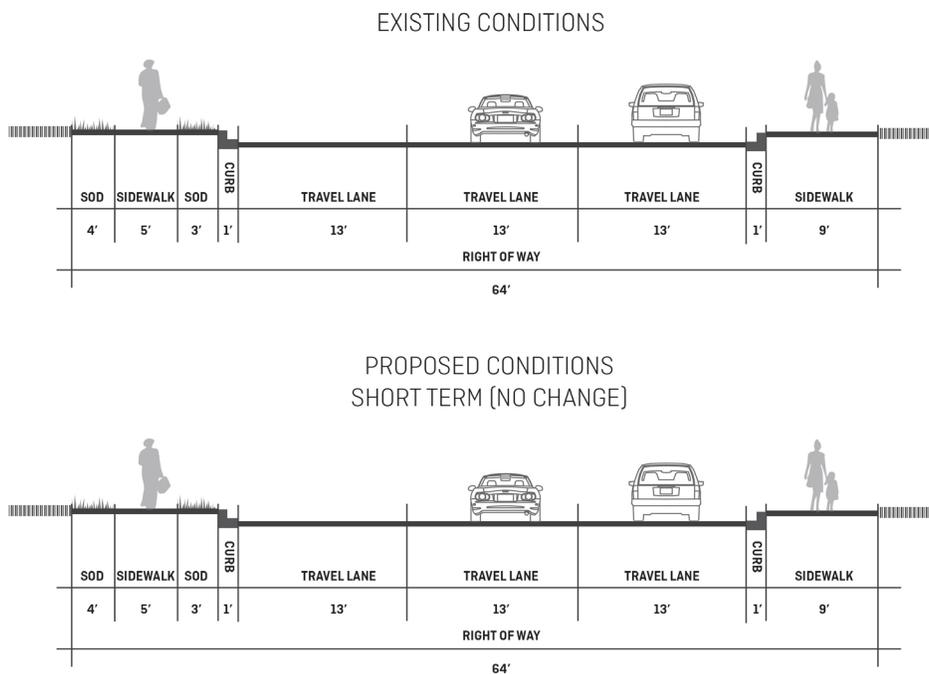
King Street at Florida Avenue (East Bound)
